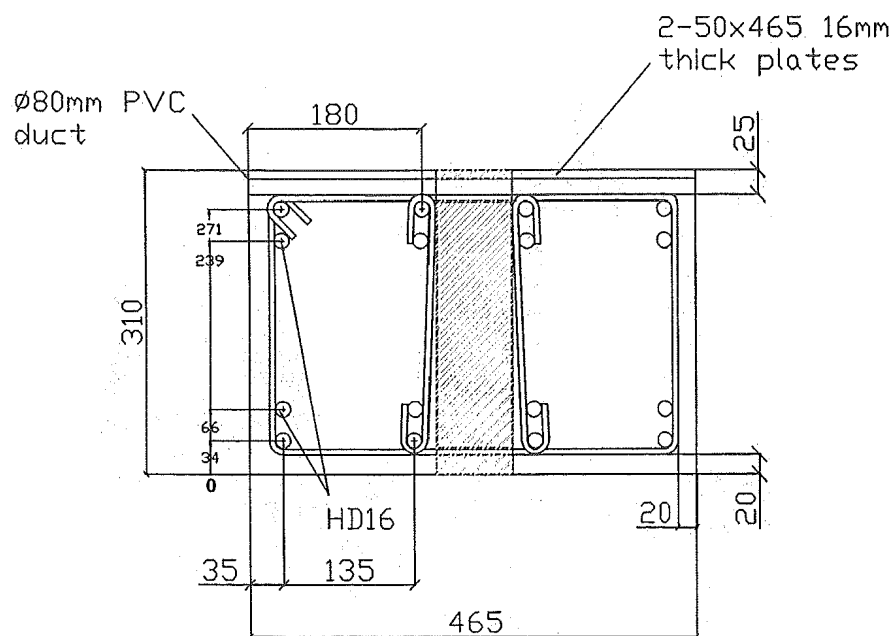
Detail showing prestressing and dissipator duct layout.
